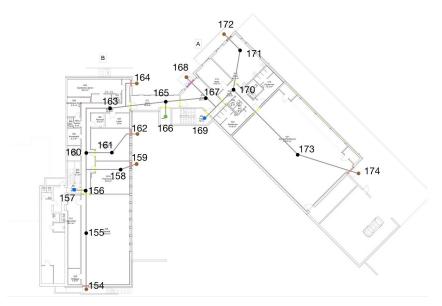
Network layout Buildings A and B on the 0^{th} floor.
